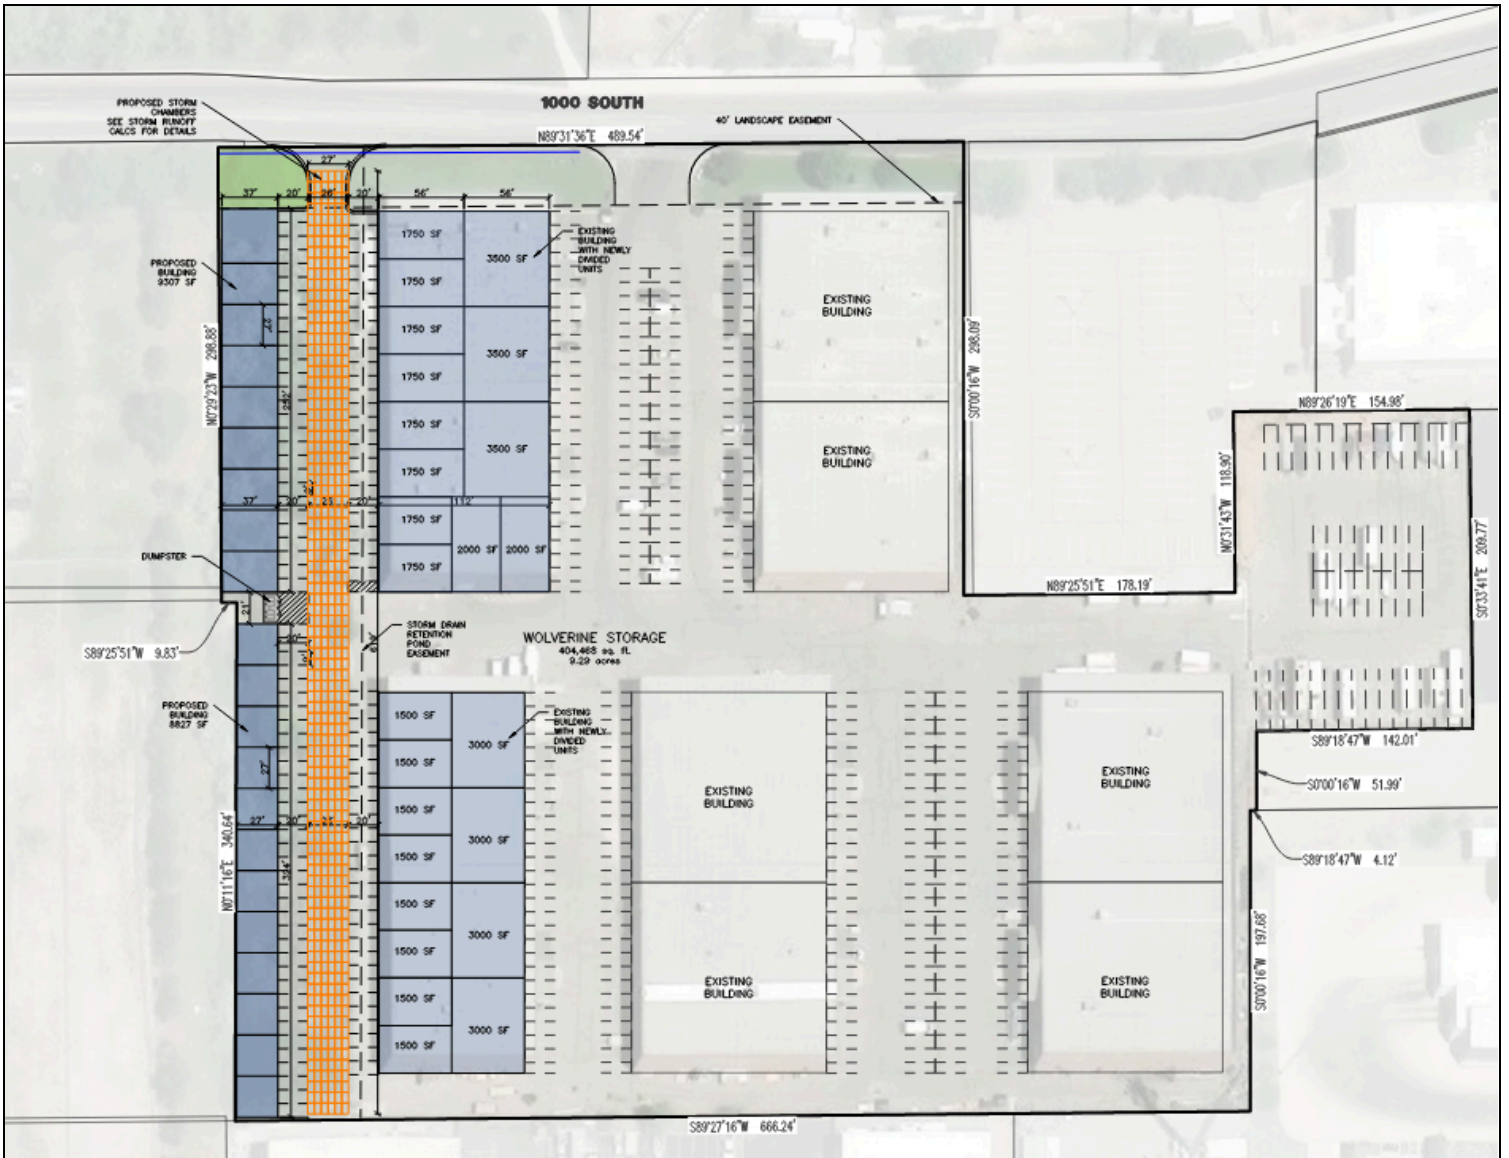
, Proposed Commercial Manufacturing (CM) concept plan for 1075 South 1675 West
